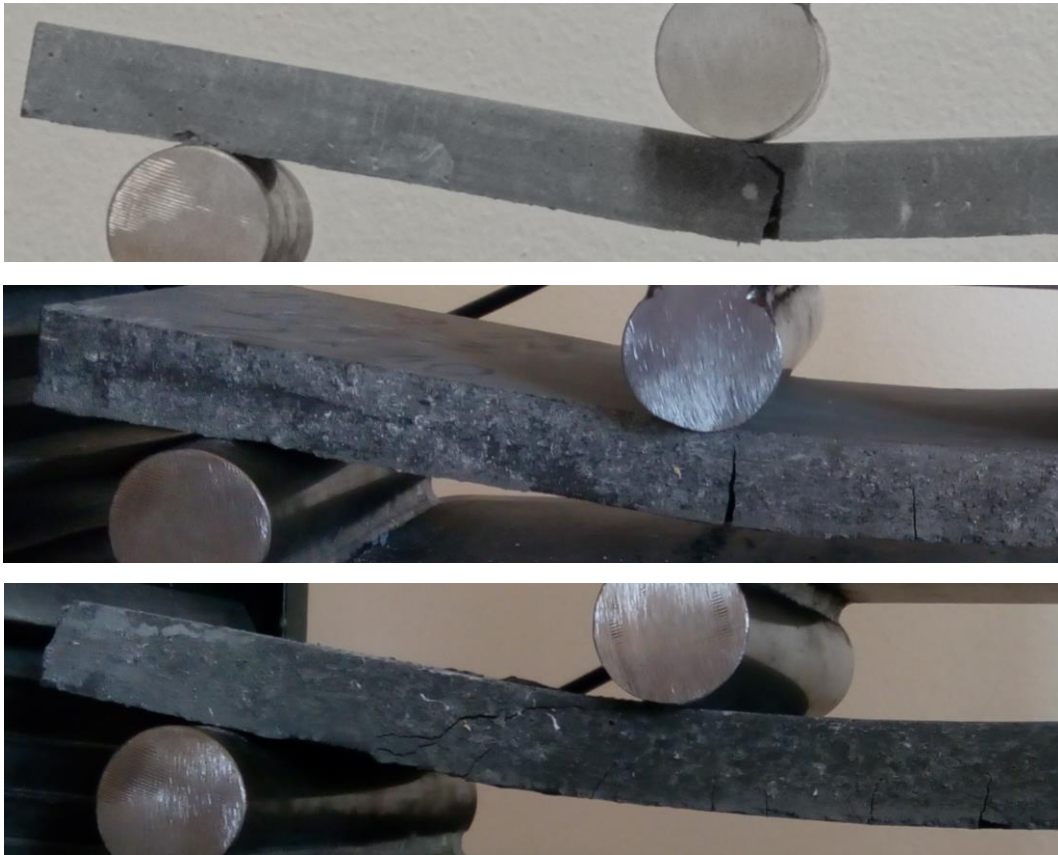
View on the specimens with different amount of reinforcement before the moment of collapse, presented specimens without surface treatment. First line 2x5, second line 2x10, third line 4x10 rovings.
